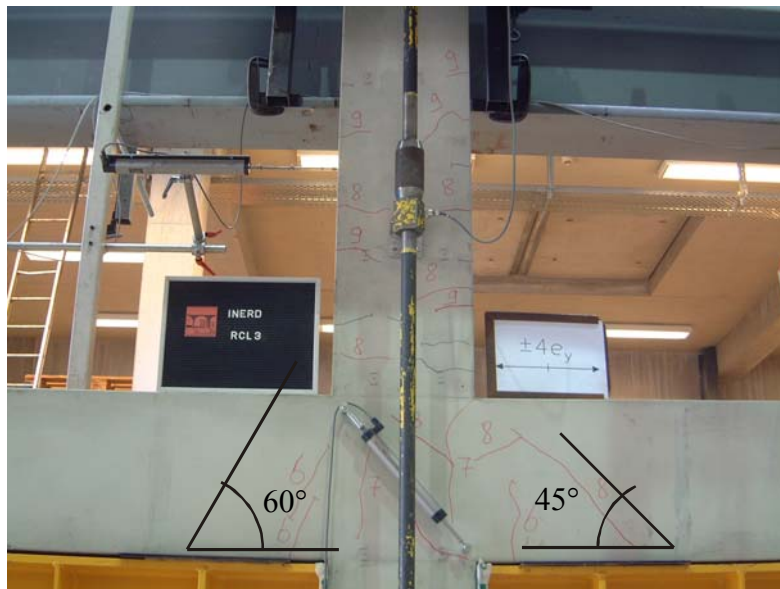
Visual inspection of the cracks in specimen RCL3
